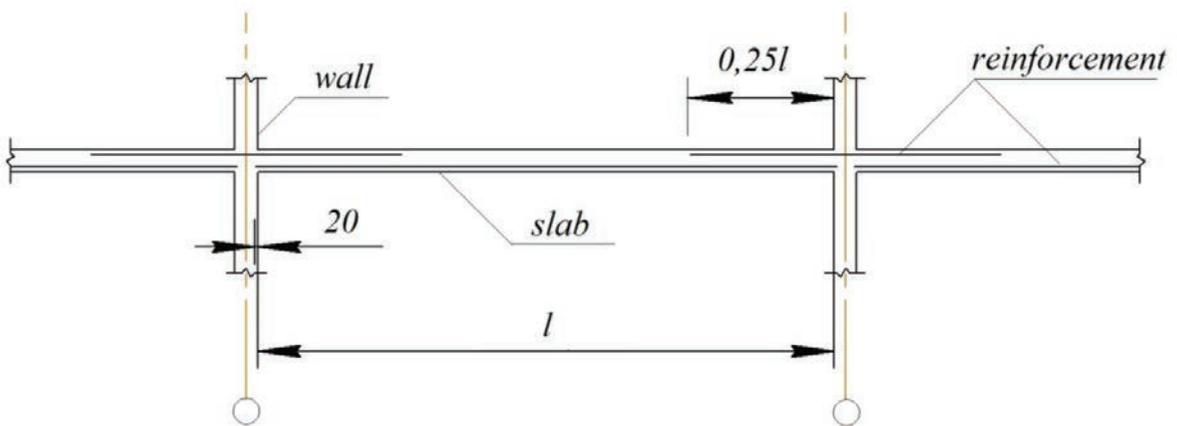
Variant of constructive solution of monolithic overlap in the building of the wall structural system
